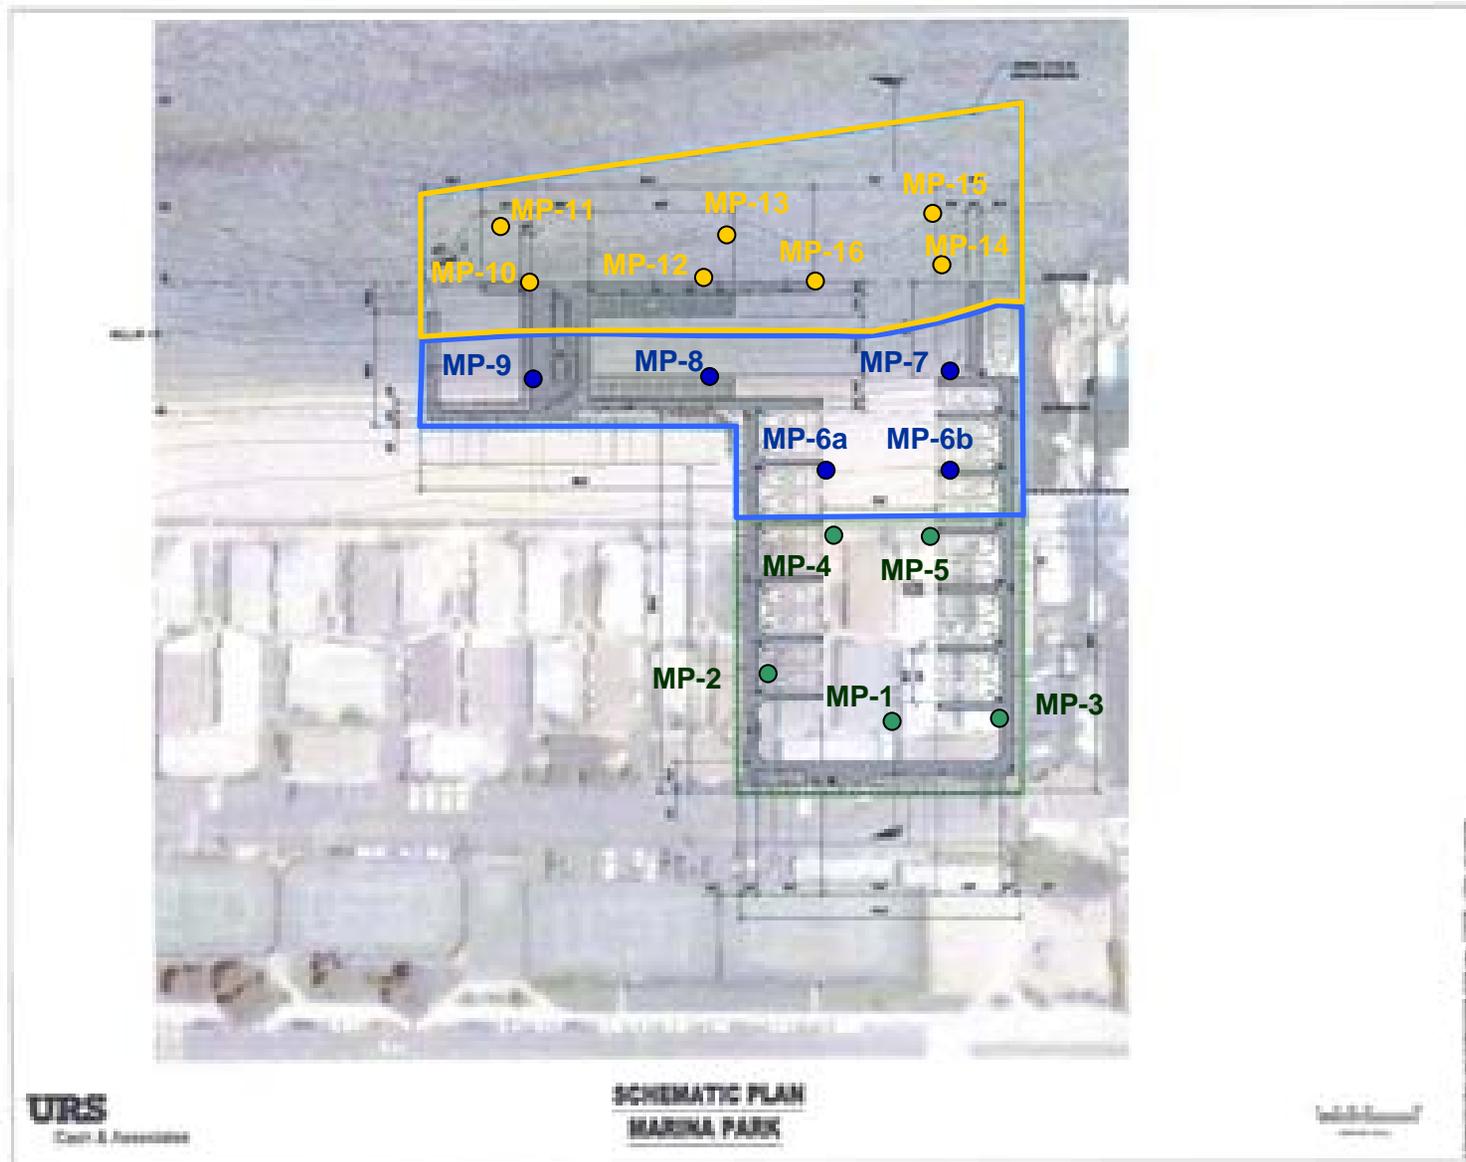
Project Areas and Station Locations with Proposed Project Plan and Current Bathymetry
